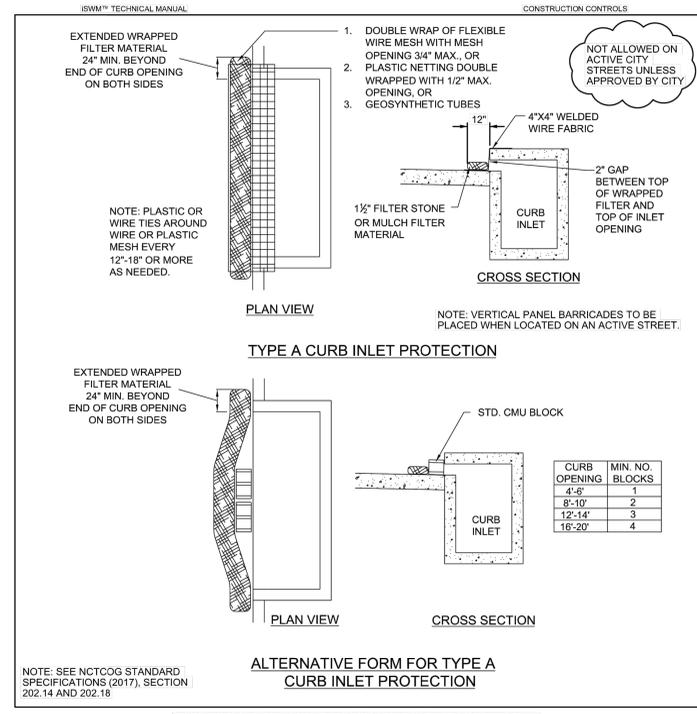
STANDARD CONSTRUCTION DETAIL - FILTER TUBE CURB INLET PROTECTION
